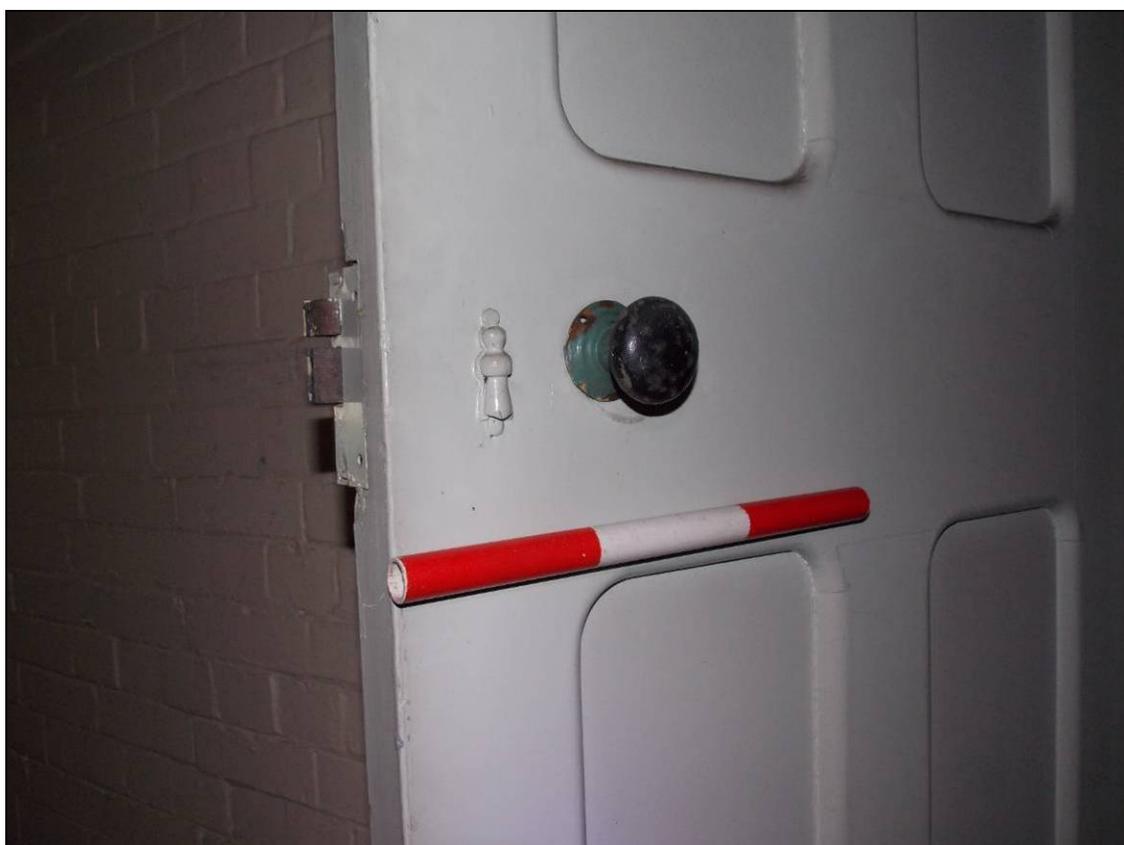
Original door with key escutcheon plate, looking east (scale 300mm).
